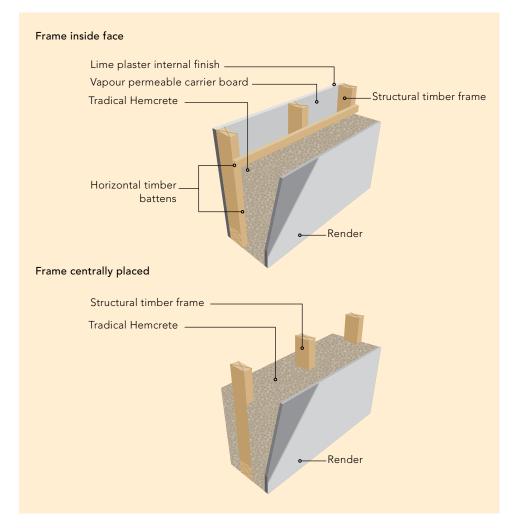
Two recognised ways of building walls with hemp lime – in this case using Hemcrete (© BBA, certificate 10/4726 (redrawn from an image © Lhoist UK))^[11]
